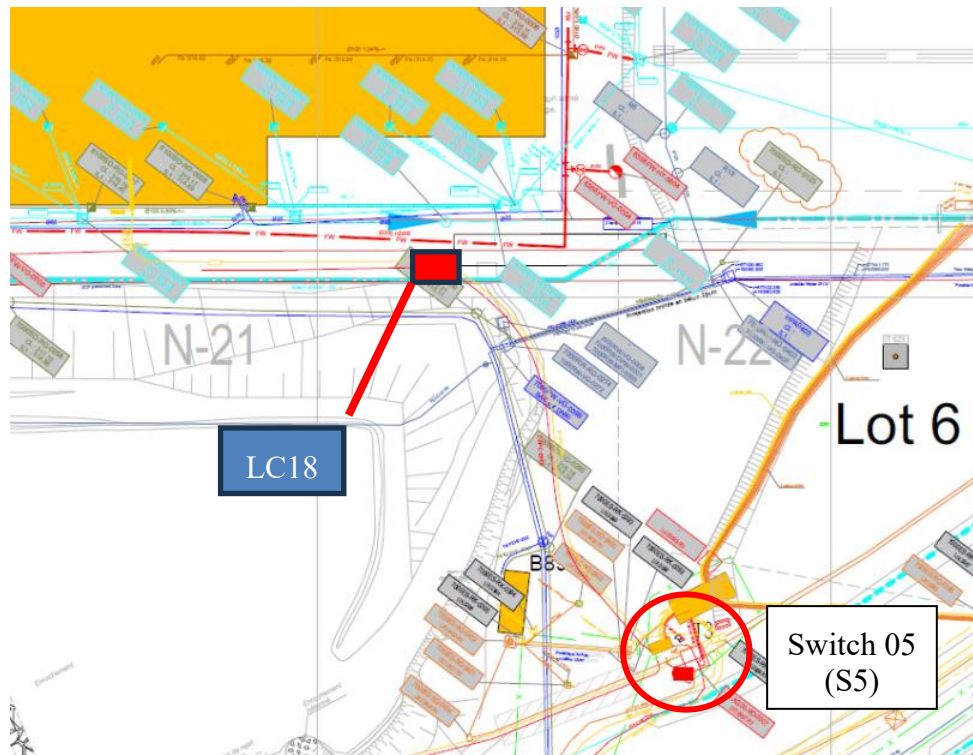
Pulling chamber to be installed between Switch S05 and B56
